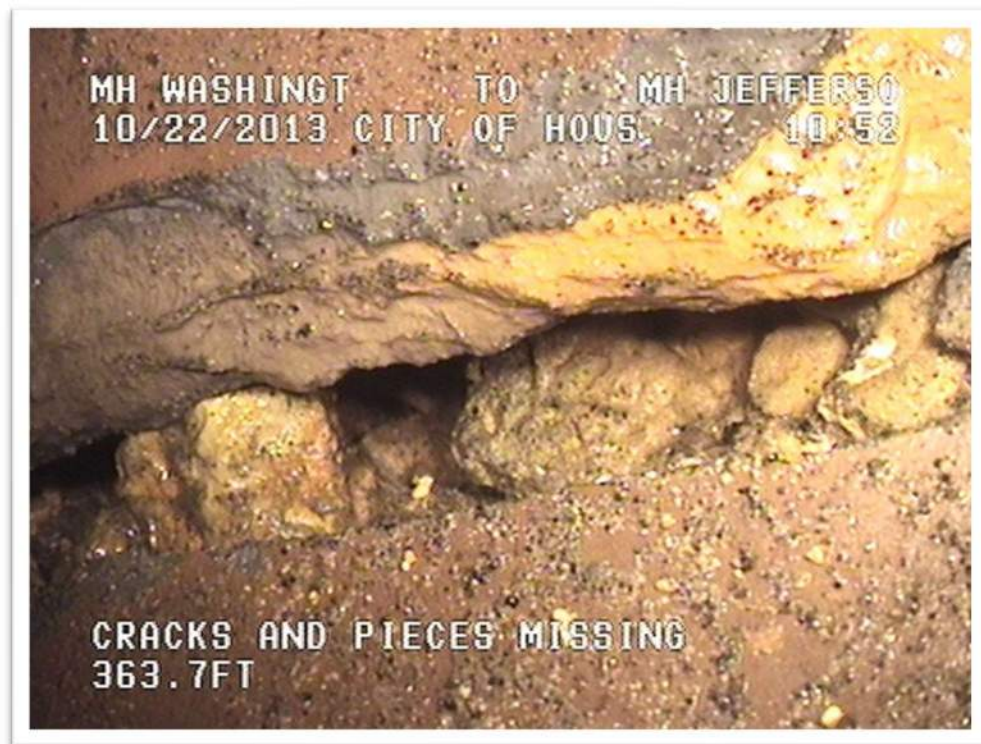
Damaged Clay Pipe Sanitary Sewer Main 10-ft West of Jefferson Street
